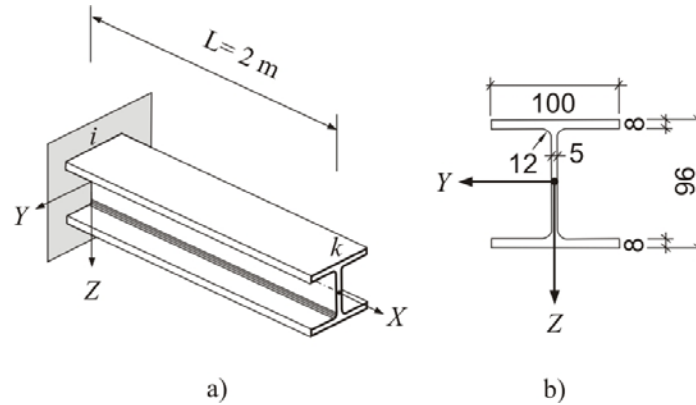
Cantilever beam with an I cross-section a) system, b) cross-section.
